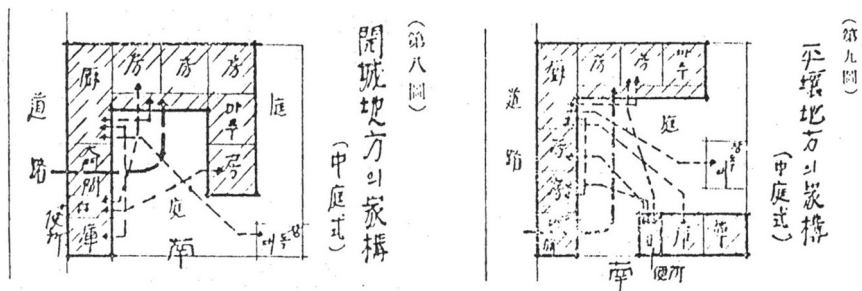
Park Gilryong, A Study of House Layout about “Courtyard Housing Plan.”
